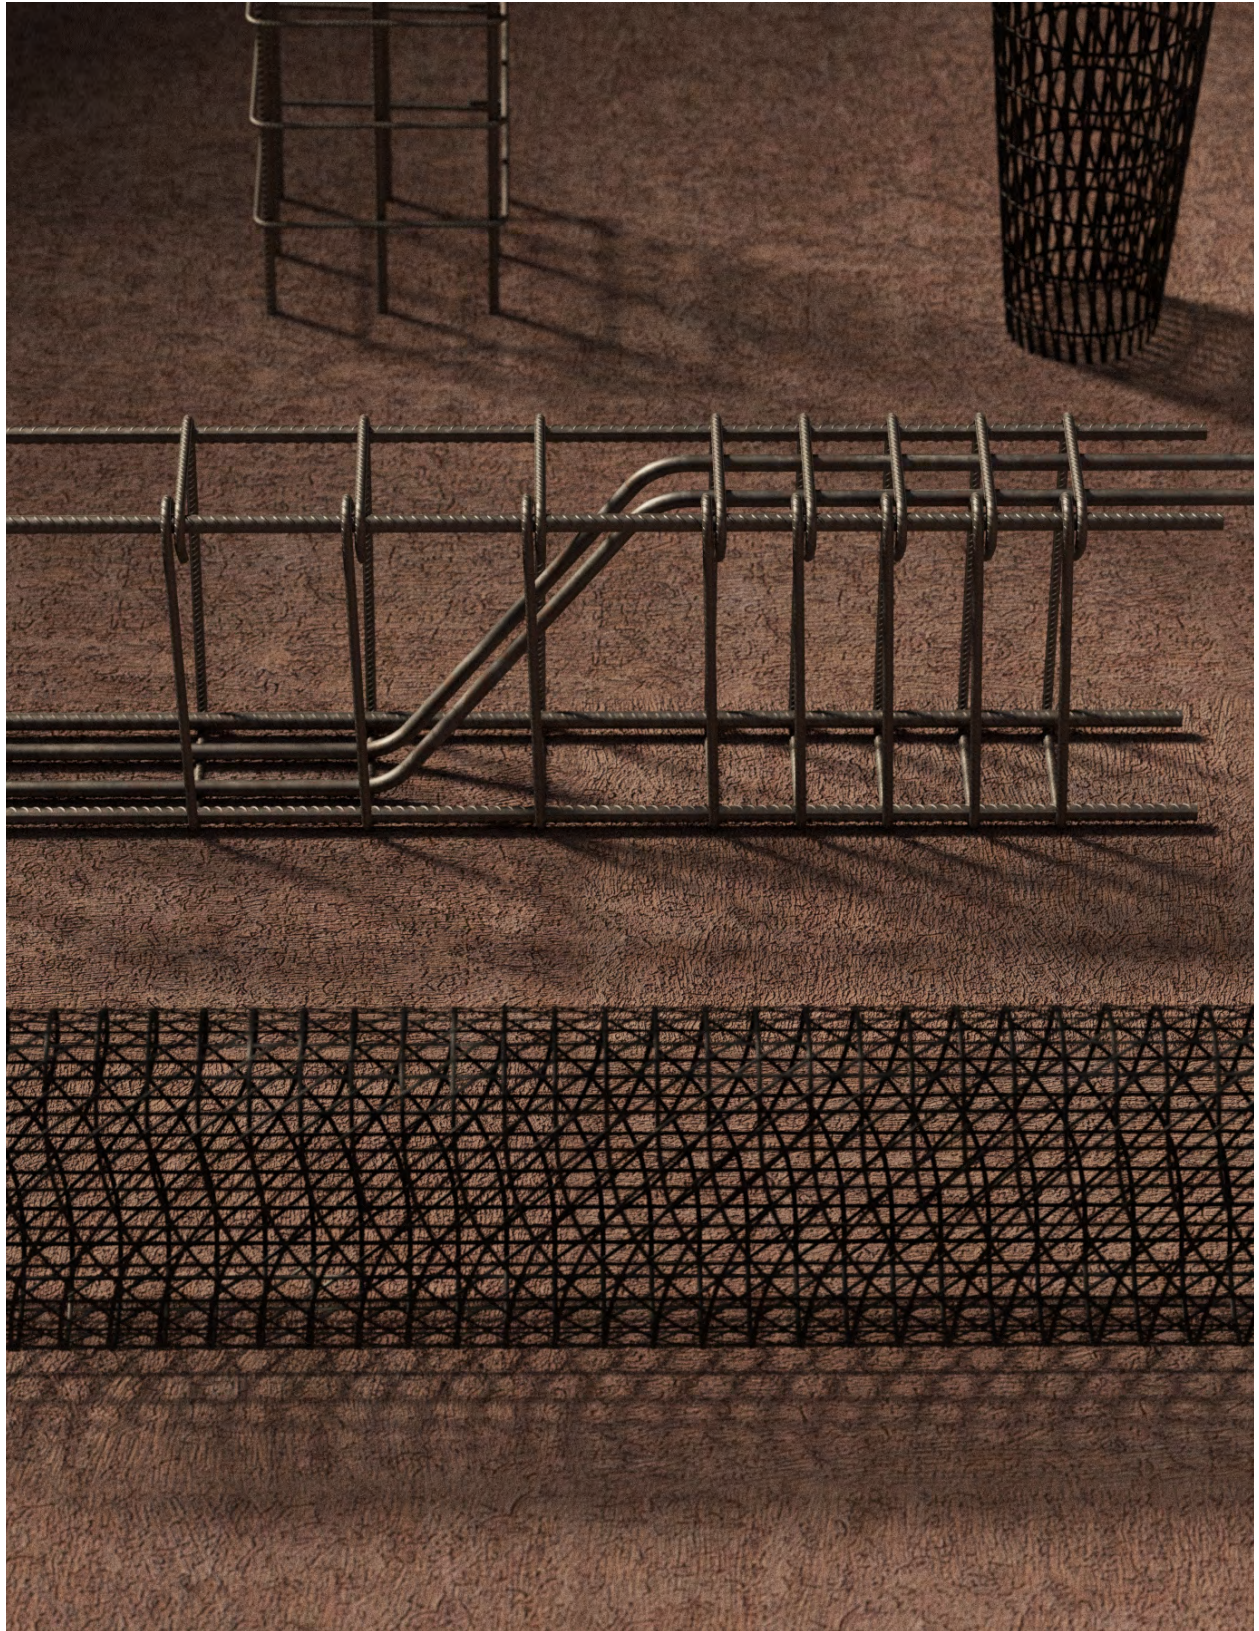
Top, Steel Reinforcement Bars with Stirrups . Bottom, Hypothetical Woven Carbon Reinforcement Network
